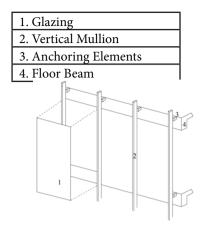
Semi-Panel System Facade Detail (Ağdemir, 2017).
